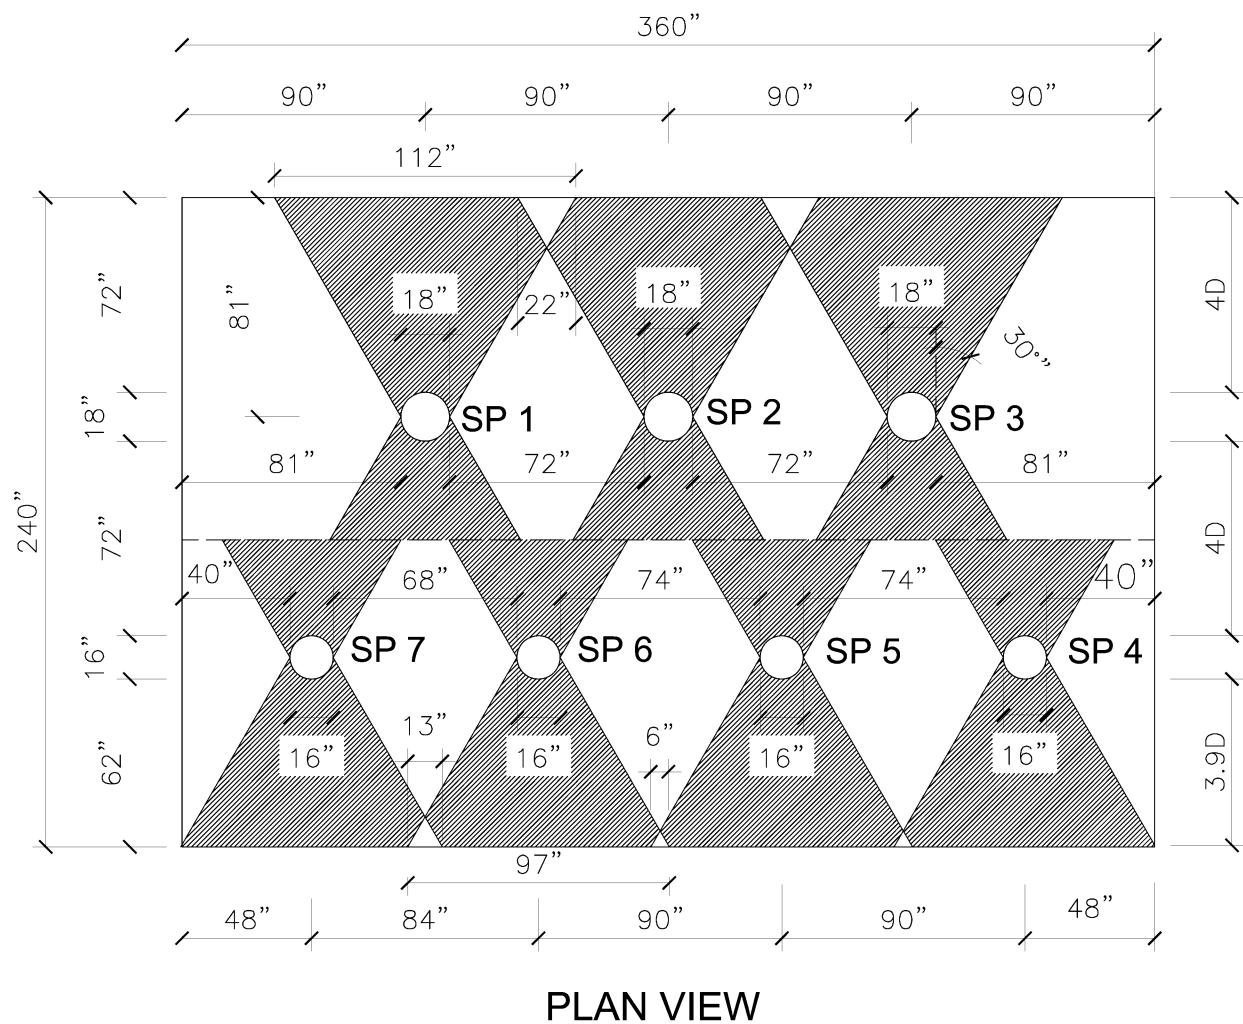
Specimen layout in the soil pit and their predicted wedge of failure at shallow depth
